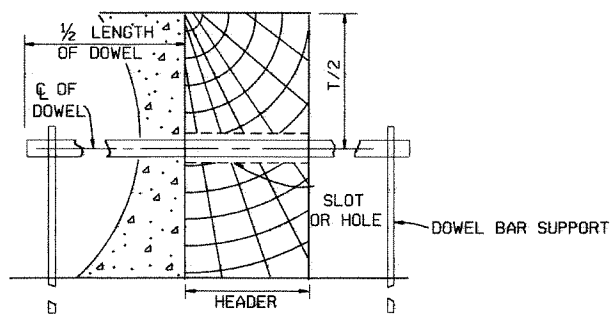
DETAIL OF JOINT SUPPORT FOR EXPANSION JOINTS
